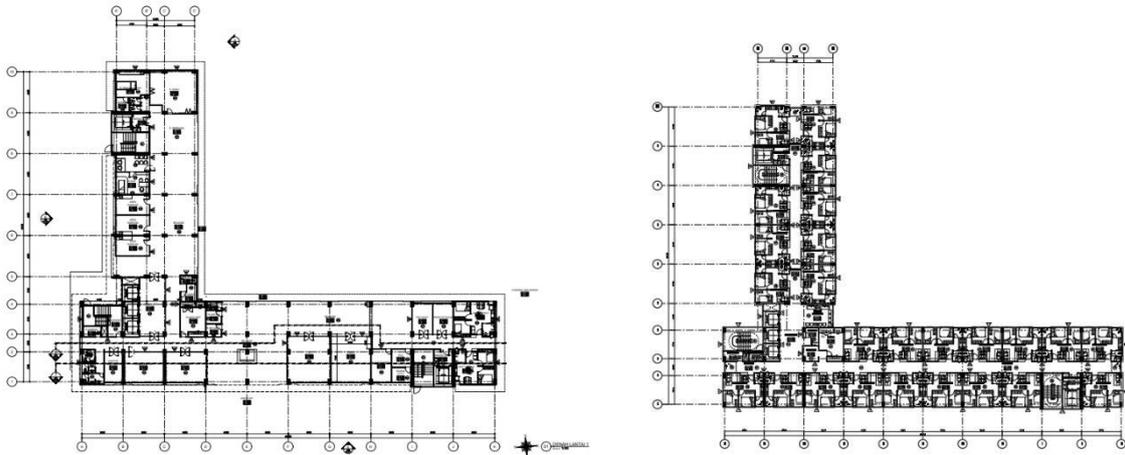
First floor plan and Second Floor Plan to Floor 16 (typical)
